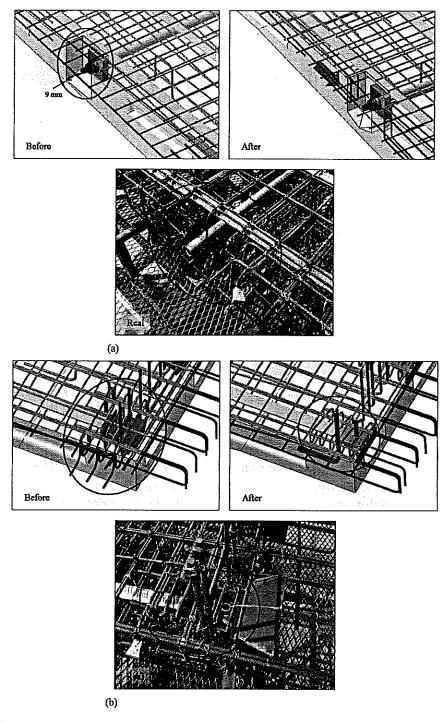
Examples of DMU. (a) Transverse pre-stressing anchor area; (b) Flat duct anchor area.
